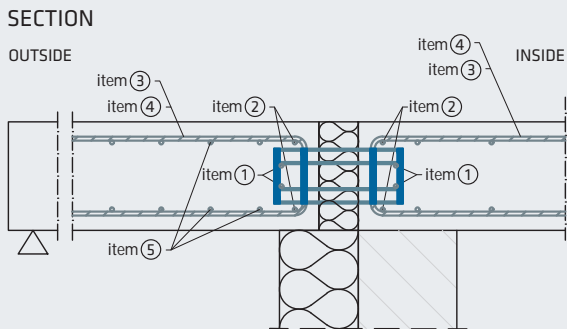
On-site reinforcement with lock bars arranged on the outside
